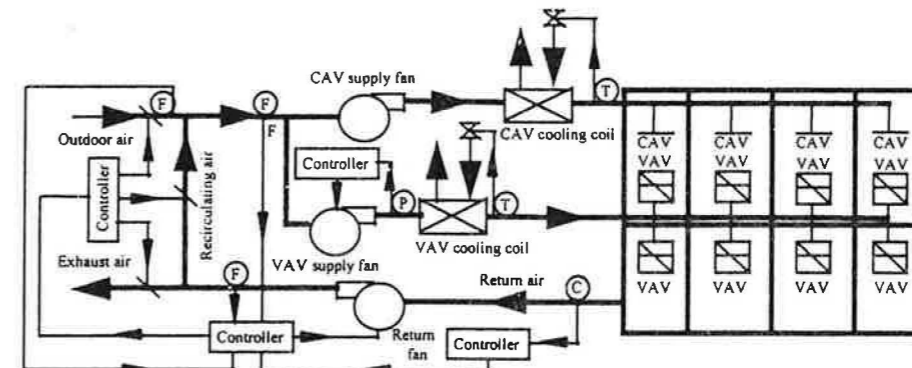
Schematic of the air-conditioning system of an open-plan office floor
